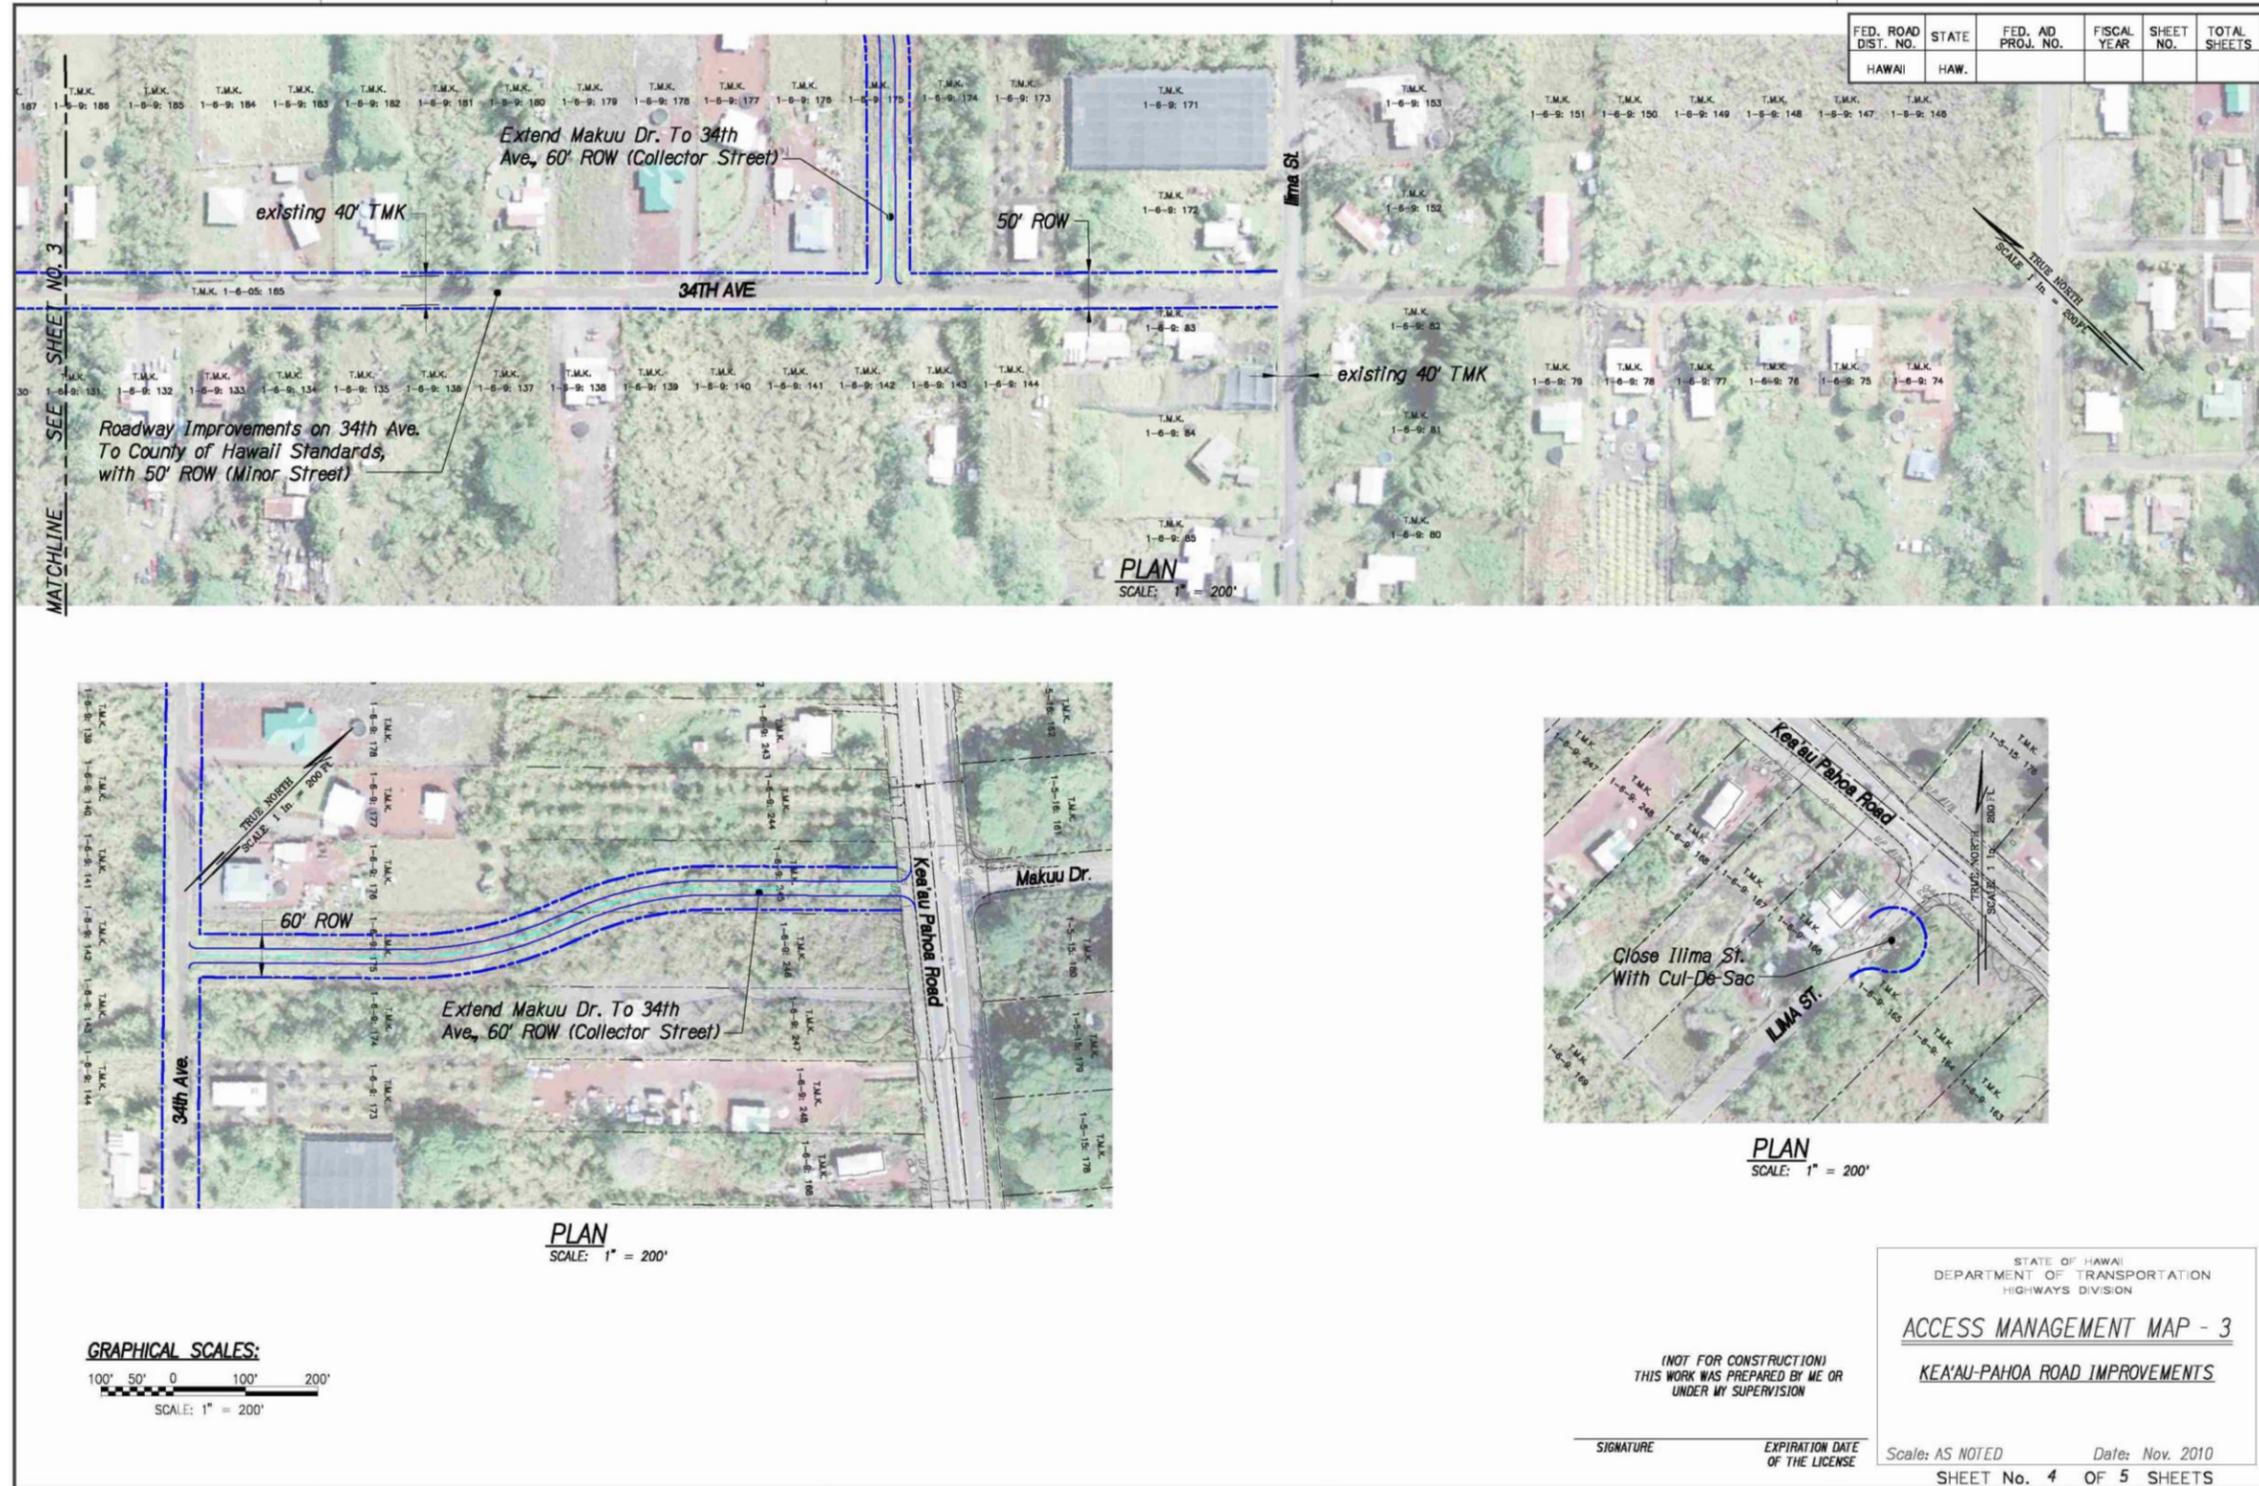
Client provided maps, detailing the southern section of the proposed improvements to 34th Avenue, the proposed Maku'u Drive extension and the proposed Ilima Street cul-de-sac
